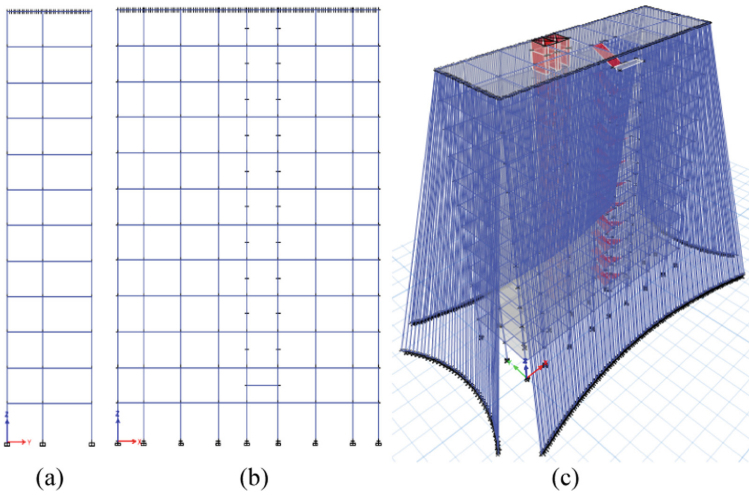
(a) (b) Elevation and (c) 3D model model of CFRP cabled frame.
